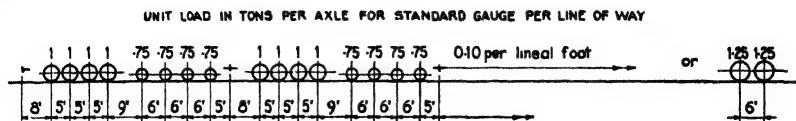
Diagram of British Standard Unit Loading for Railway Bridges.
